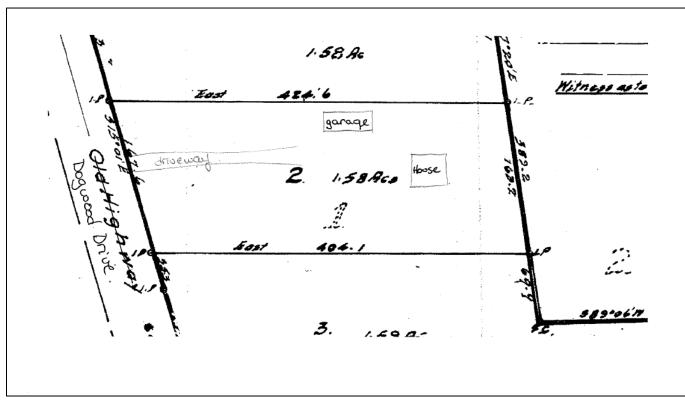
Site Plan for 341 Dogwood Drive (not to scale)
